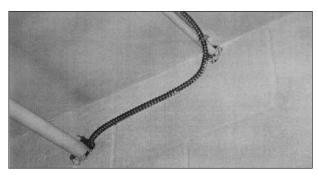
Plumbing penetrations of parking garage walls (photo: Proskiw Engireering Ltd.)
